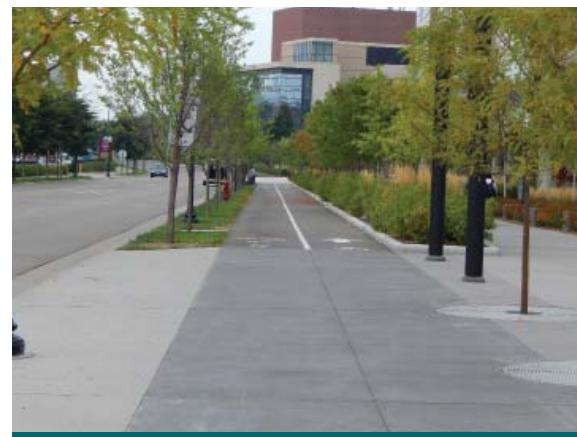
On this site, the road, bike lanes, pedestrian walkway and building are separated by three separate LID practices. (Source: Aquafor Beech)
